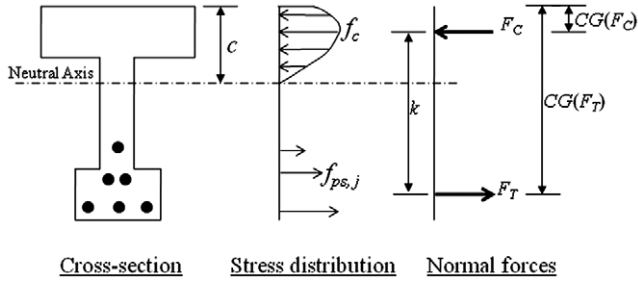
Simplified cross-section of a box girder showing the stresses and forces (after [27]).
